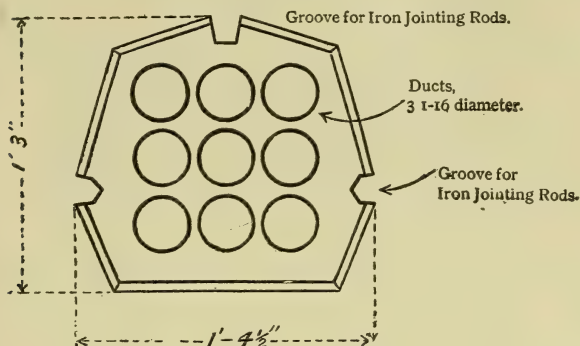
End View of 9-Duct Concrete Conduit Block
